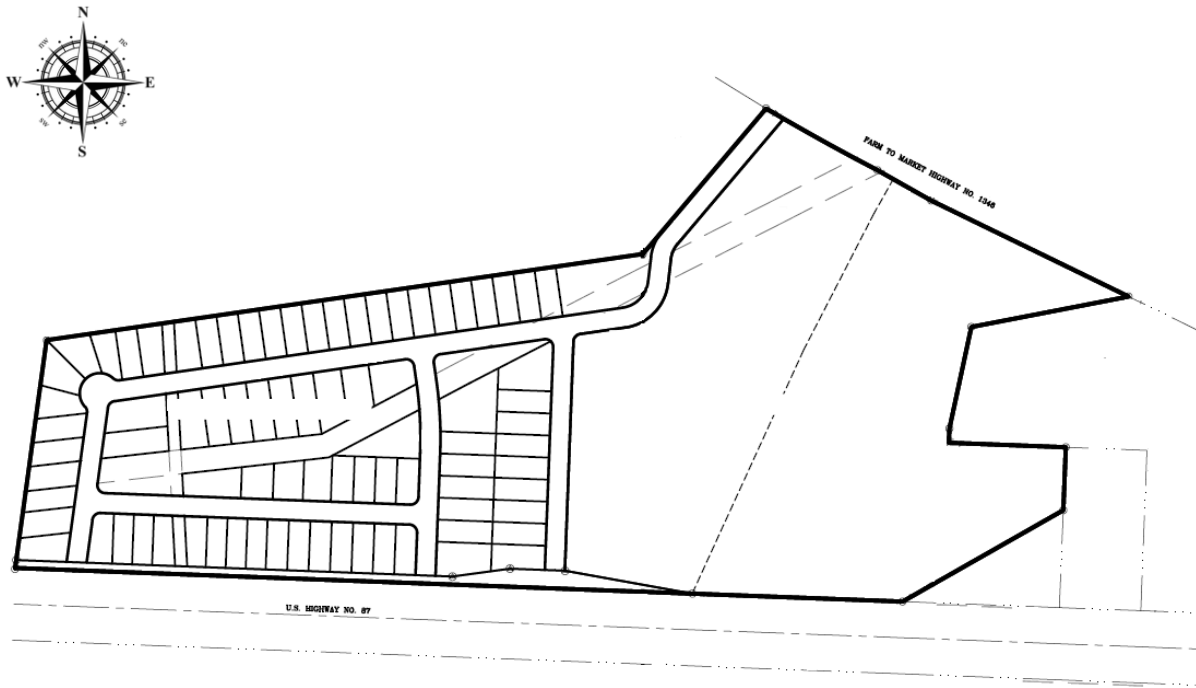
Site Plan for Proposed NP Homes Subdivision with Proposed Driveways
